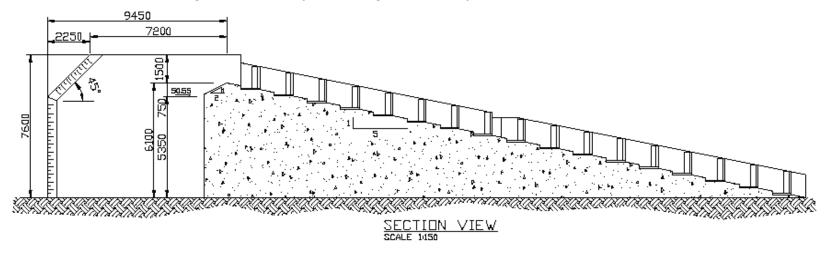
Elevation drawing of the fishway-canoe chute as tested in the 1:15 scale model tests
